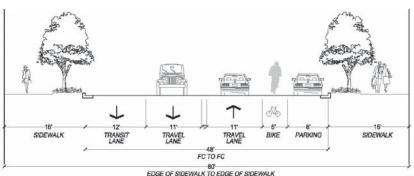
Recommended mid-block cross-section with one-way transit looking north between 12th Street S. and 26th Street S.
